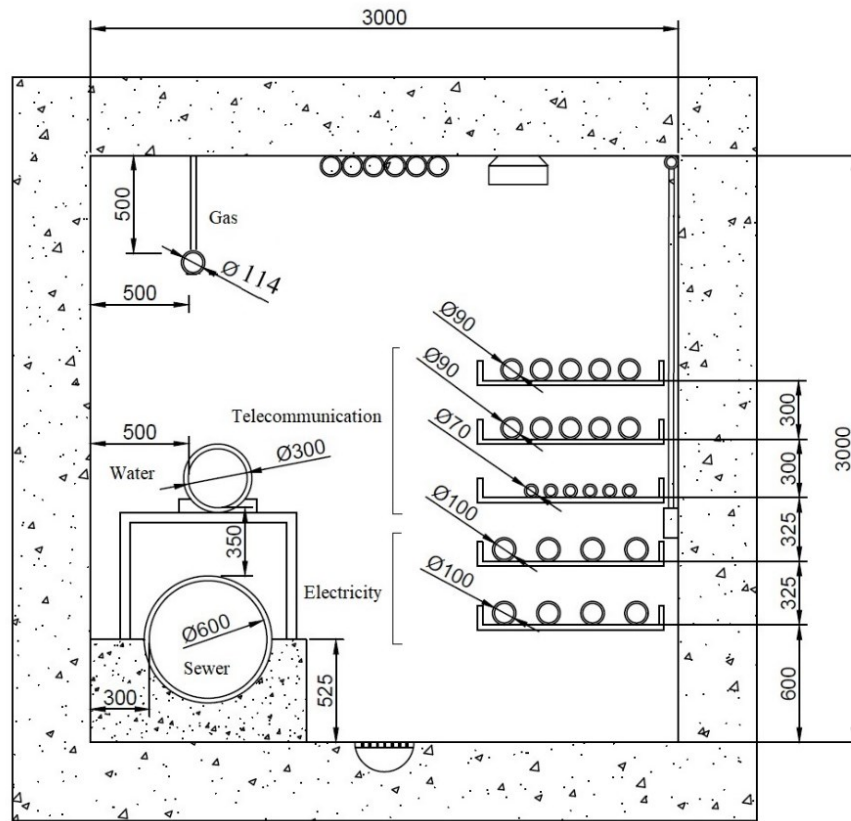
Cross-section of MUT (adapted from drawings provided by City of Montreal)
